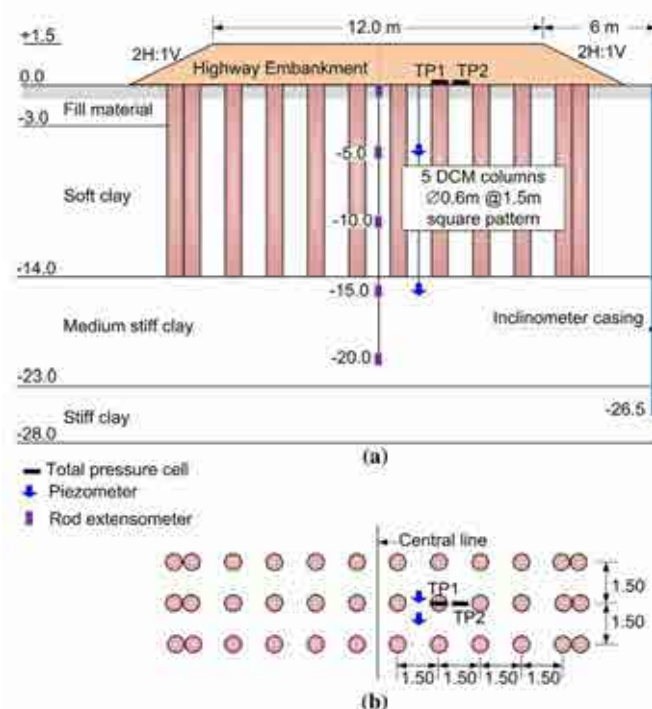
Cross-sectional and plan views of the DCM column-supported embankment and locations of instrumentations: (a) cross-sectional view and (b) plan view of the instrumented embankment (Jamsawang et al., 2016).
